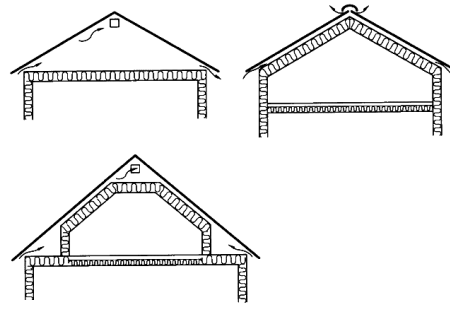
Examples of typical ventilated roof designs. (Figure from SINTEF Building Research Design Sheets.)
